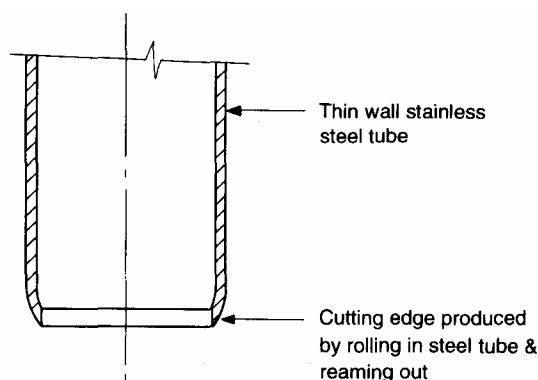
Typical detail of thin-walled open-drive sampler, showing drawn in, sharpened cutting edge.
